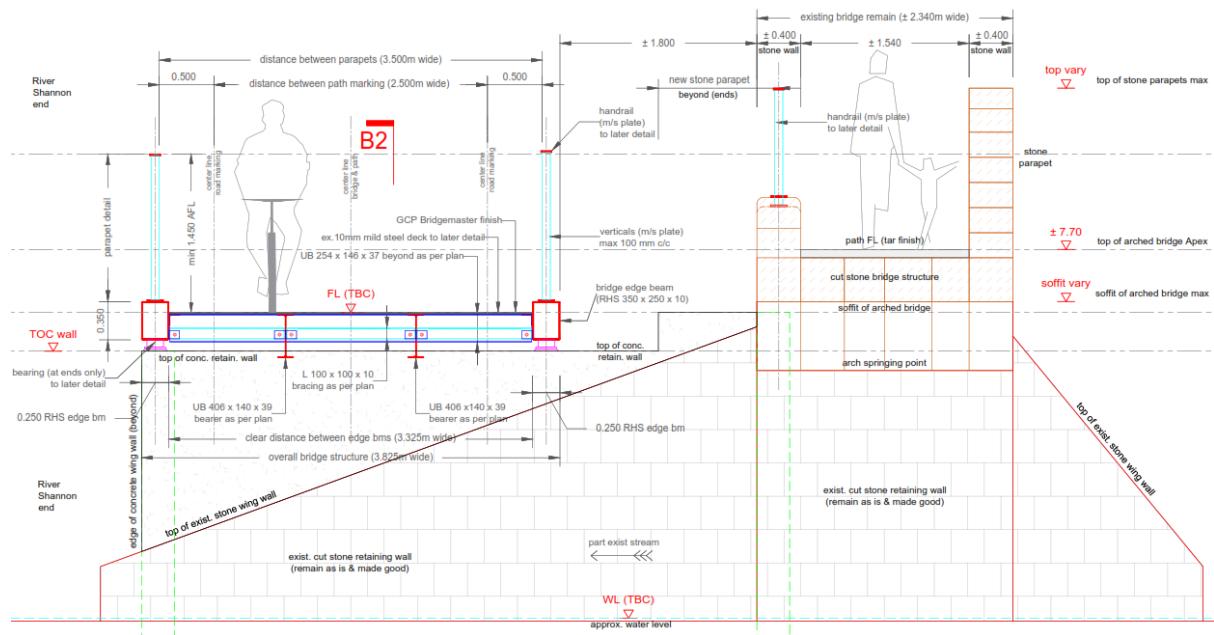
Section for the proposed new bridge 2 alongside the existing stone bridge (refer to drawing RHA-XX-DR-S-SP0021)
